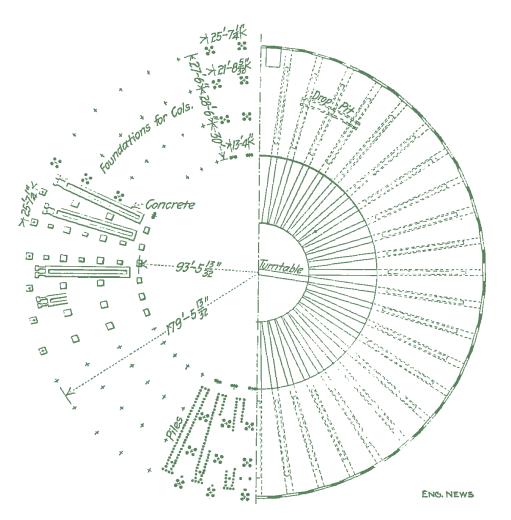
PLAN OF ENGINE HOUSE SHOWING FOUNDATION AND TRACK LAYOUT.
